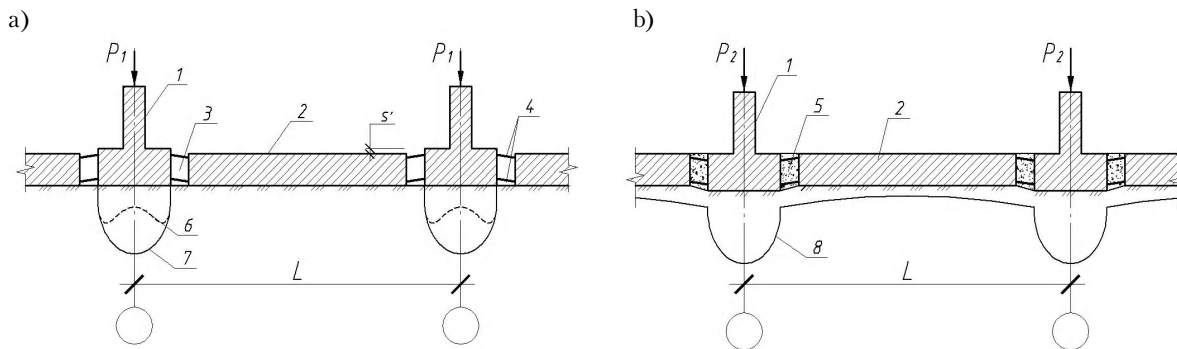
Distribution of contact pressure: a) separate work of supporting elements and the span elements of slab foundation; b) joint work of supporting elements and the span elements of slab foundation; 1 – the supporting elements of slab foundation; 2 – the span elements of slab foundation; 3 – temporary deformation seams; 4 – main continuous reinforcement; 5 – monolithic concrete; 6 – diagram contact pressure under the supporting element at pressures less than the initial critical pressure; 7 – diagram contact pressure under the supporting element at pressures higher than the design resistance of foundation soil; 8 – diagram contact pressure after inclusion in the work the span elements.
